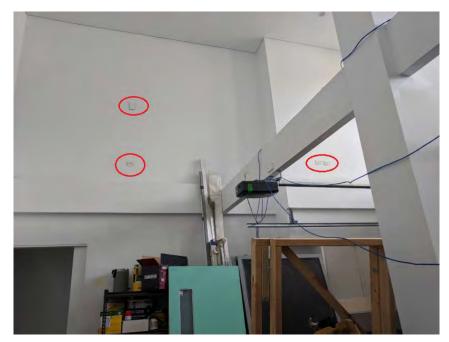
Power points and lights switches shown in the upper void area, along with supports for the new floor are further evidence the dwelling house was constructed in anticipation of increasing the gross floor area of the building.
